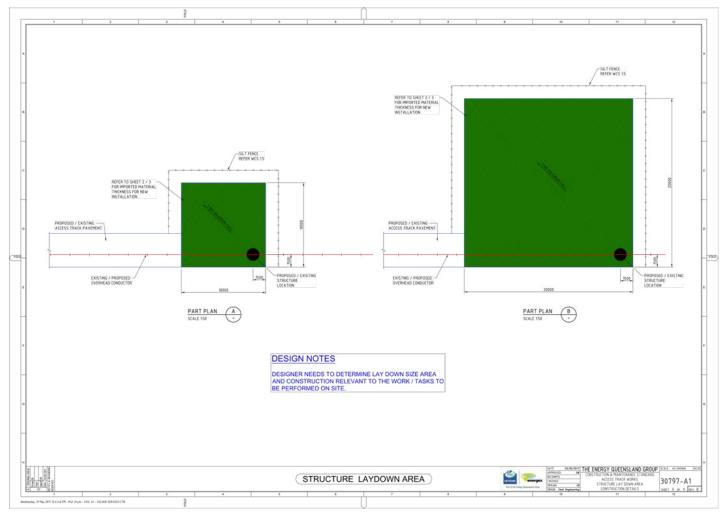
Access Track Infrastructure – Structure Laydown Area - Details
